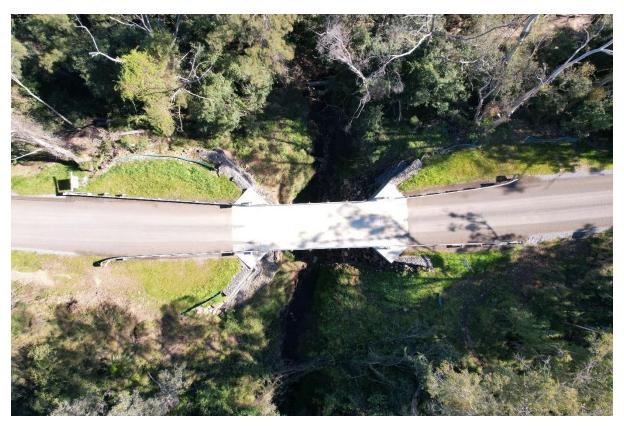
Bradburys bridgeA new concrete bridge has been provided.
